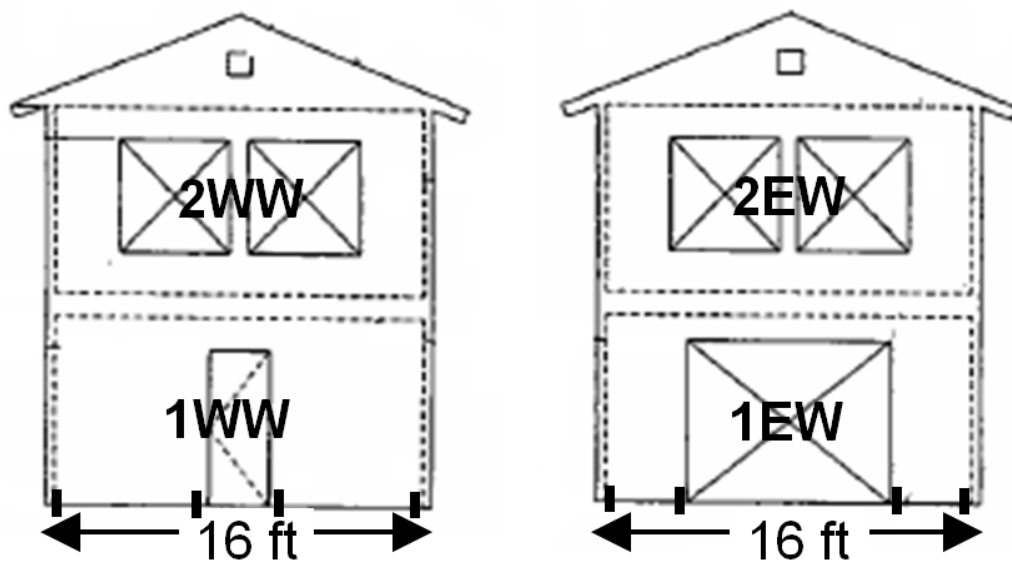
X – direction elevation view and dimensioning of the one-storey woodframe building (Rosowsky and WeiChiang, 2007)
